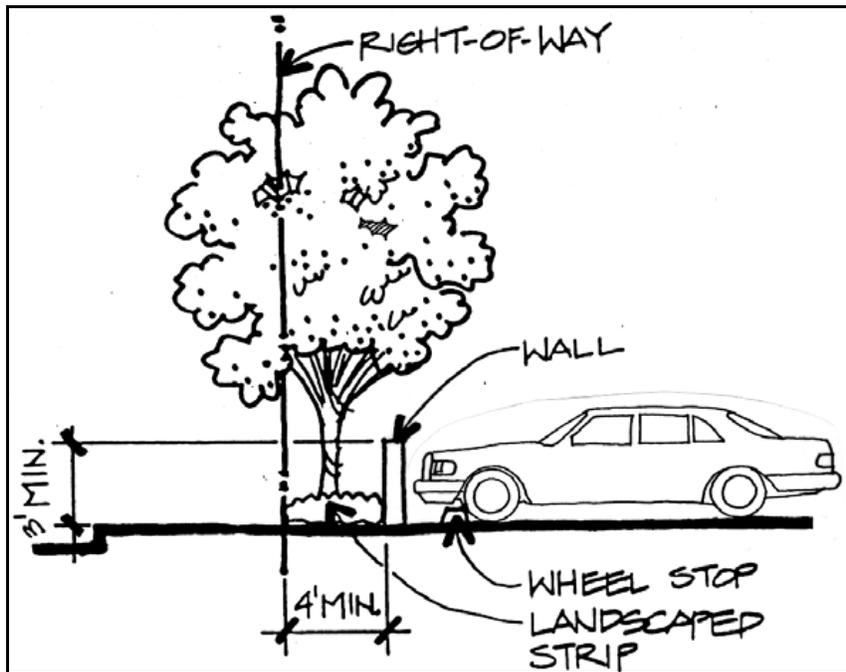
Parking Lot Landscaped Strip, Option 4
